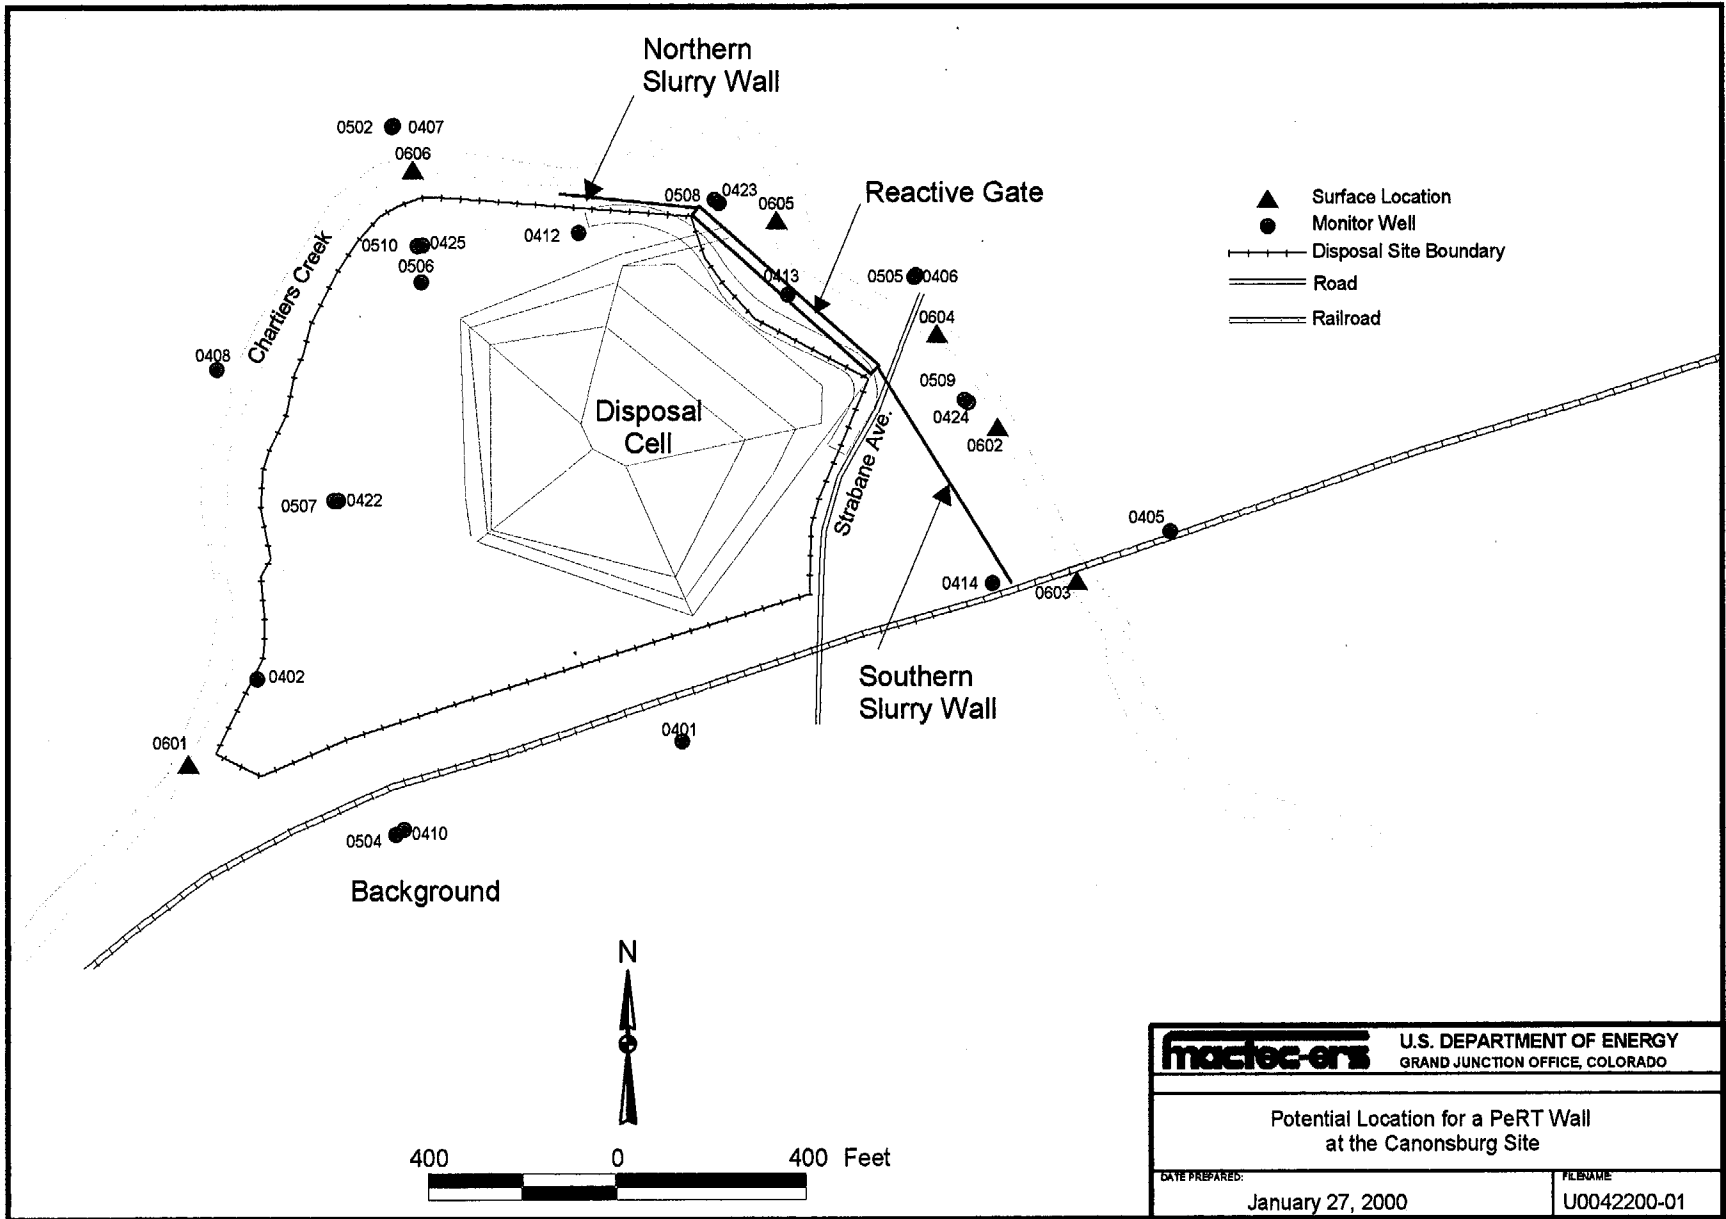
Potential Location for a PeRT Wall at the Canonsburg Site
